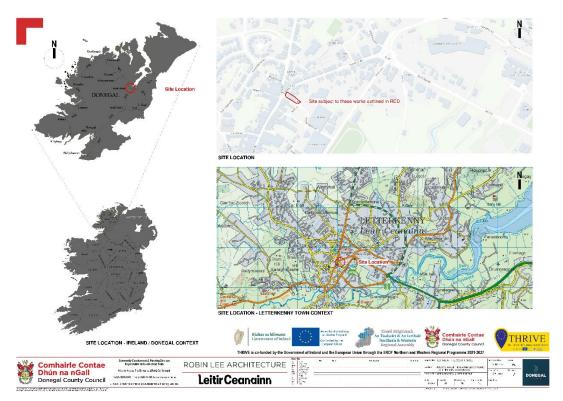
Drawing No: D.000 (Site Location and Site Extent)
